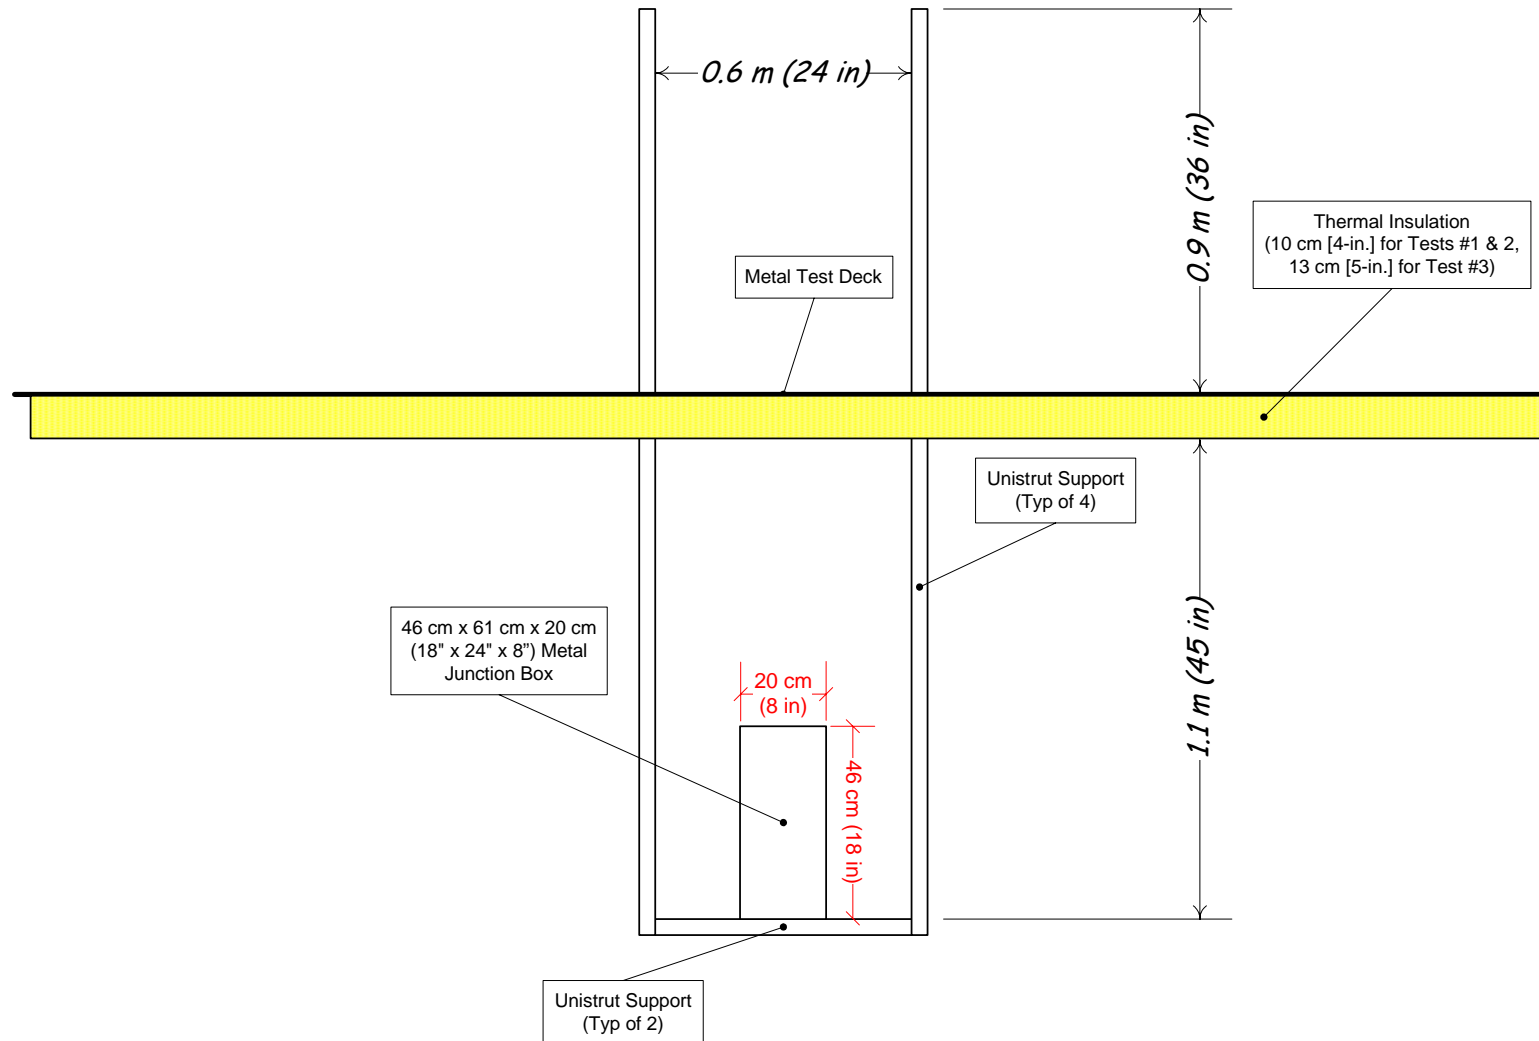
(a): Junction box test specimens (front elevation view with dimensions).
